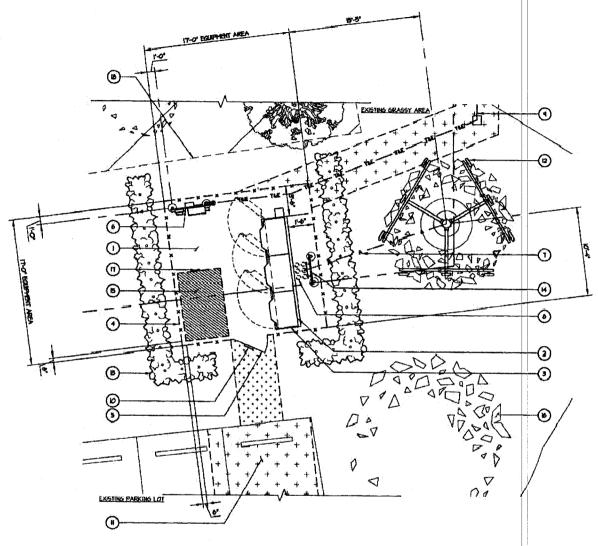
EXHIBIT B SITE PLAN/SKETCH OF PROPERTY
